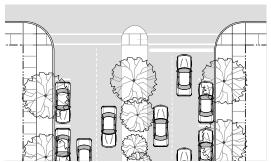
(2). Wide Street Crossing with Pedestrian Refuge Median.
